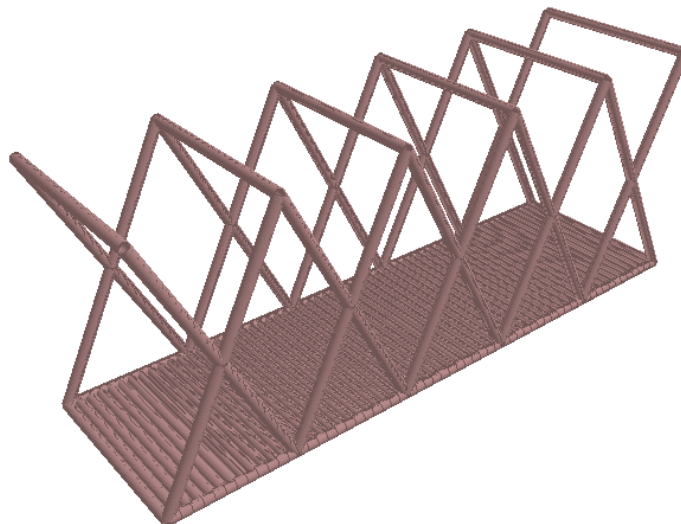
3D View of Pedestrian bridge made up of Bamboo without stiffener
